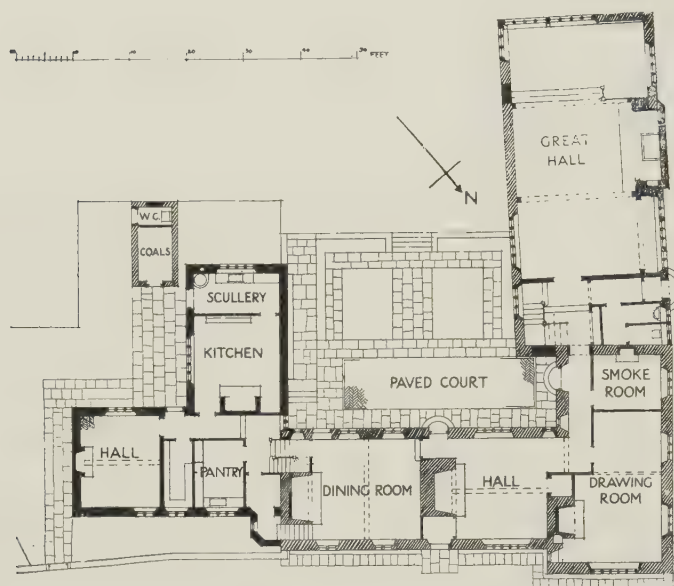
Its downstairs rooms serve now as hall, drawing-room and smoke-room. About a hundred years later it belonged to a family named Walker, and they doubtless built the room now used for dining to the left of the main entrance. It is typical of the steady devotion to old traditions which marks Cotswold building, that the Walker of about 1720 was oblivious of the neo-classic fashions which had entirely captured
